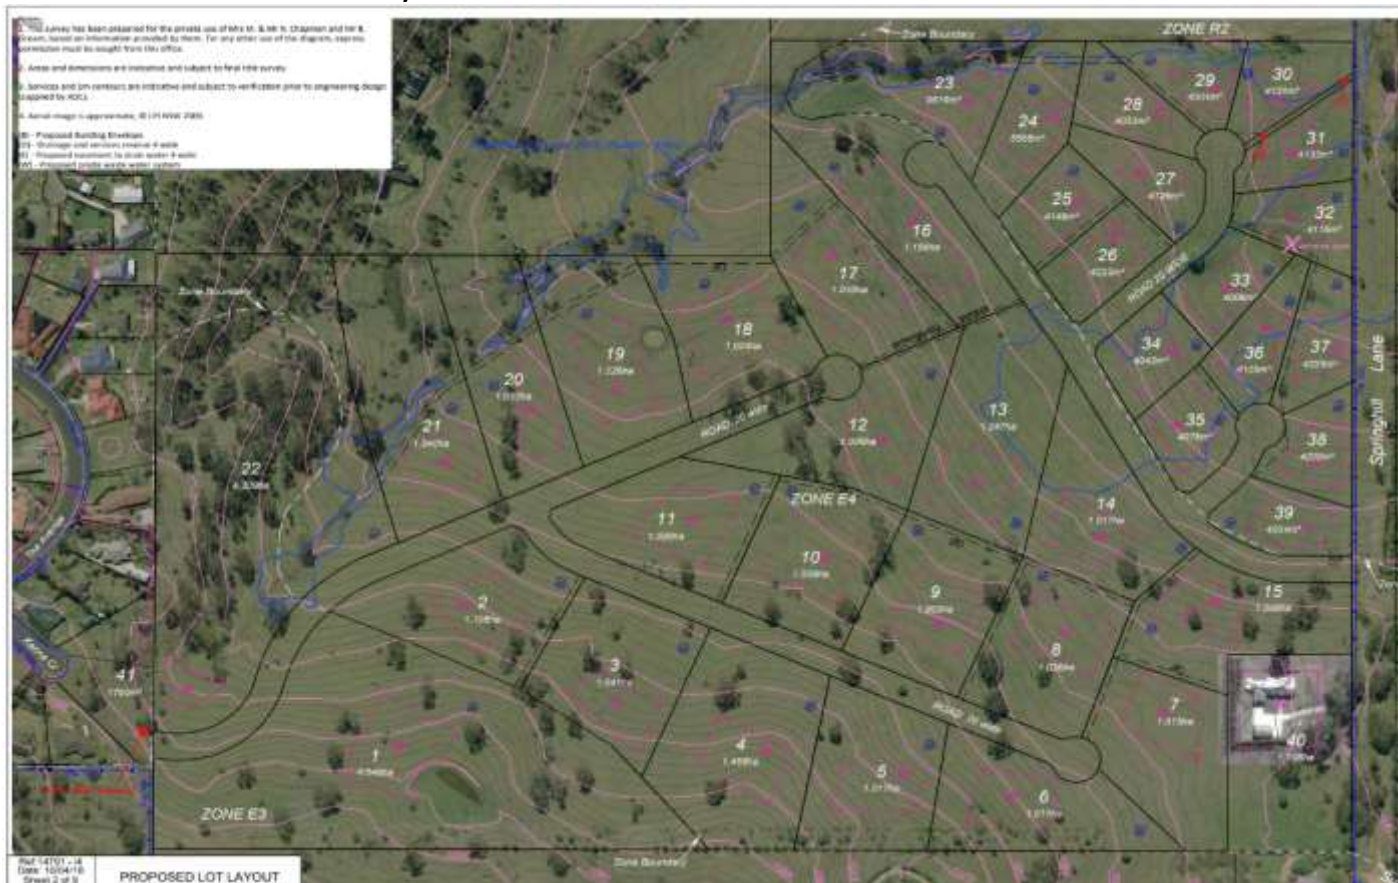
Amended Subdivision Layout – Aerial Plan
